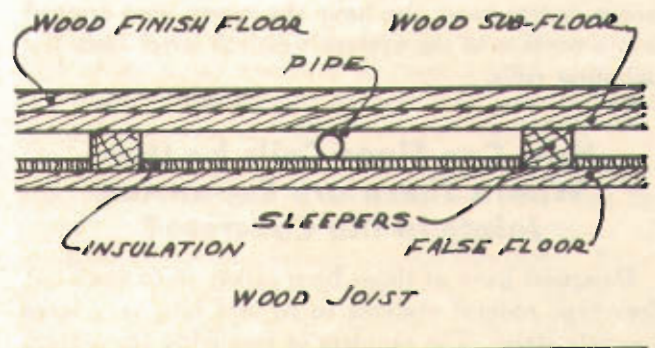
Furred Wood Floor—Pipes Resting on False Floor.
